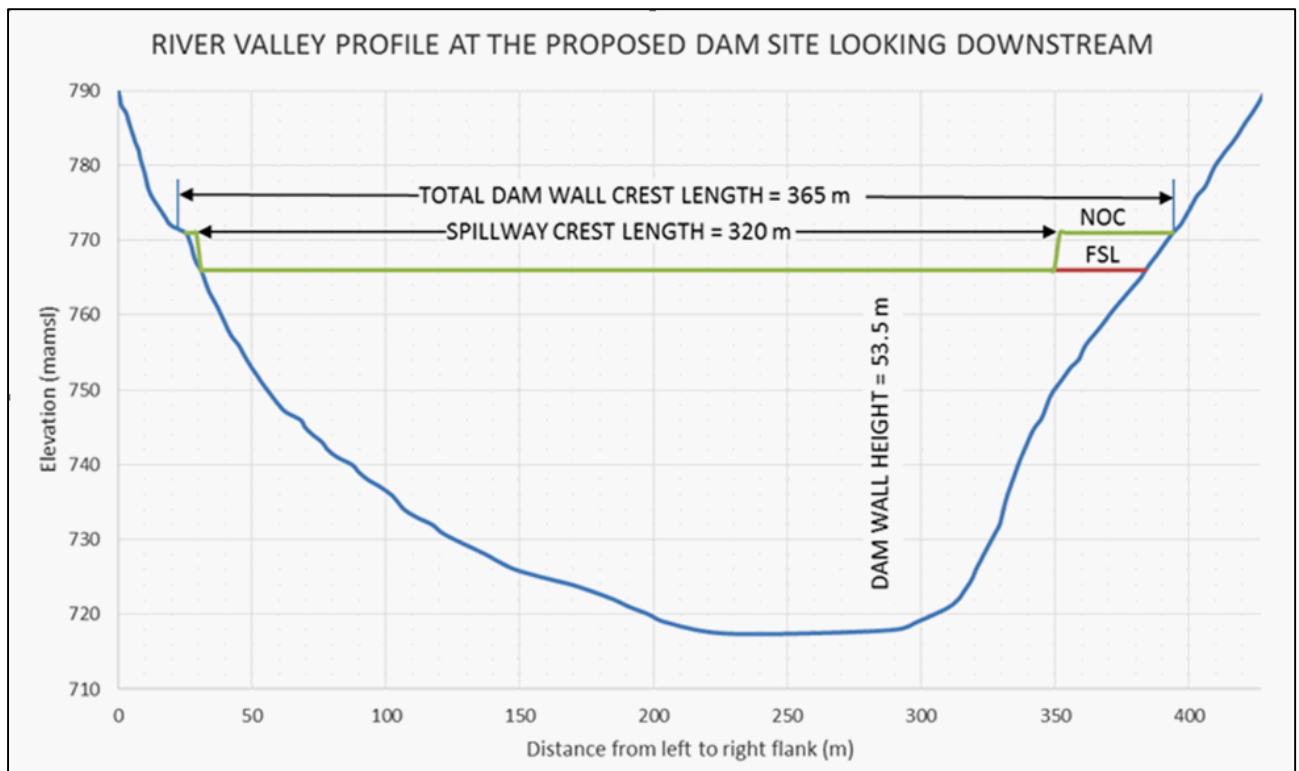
Cross-section of Valley (looking downstream) at Dam Wall Centreline
